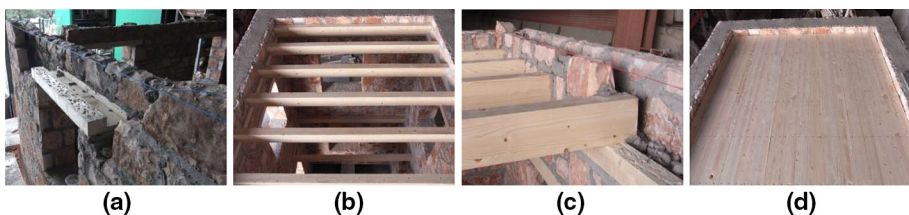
Structural details of the timber elements of PBM. a Timber lintels, b timber joists, c timber joists to wooden collector beam connection, d timber pavement
